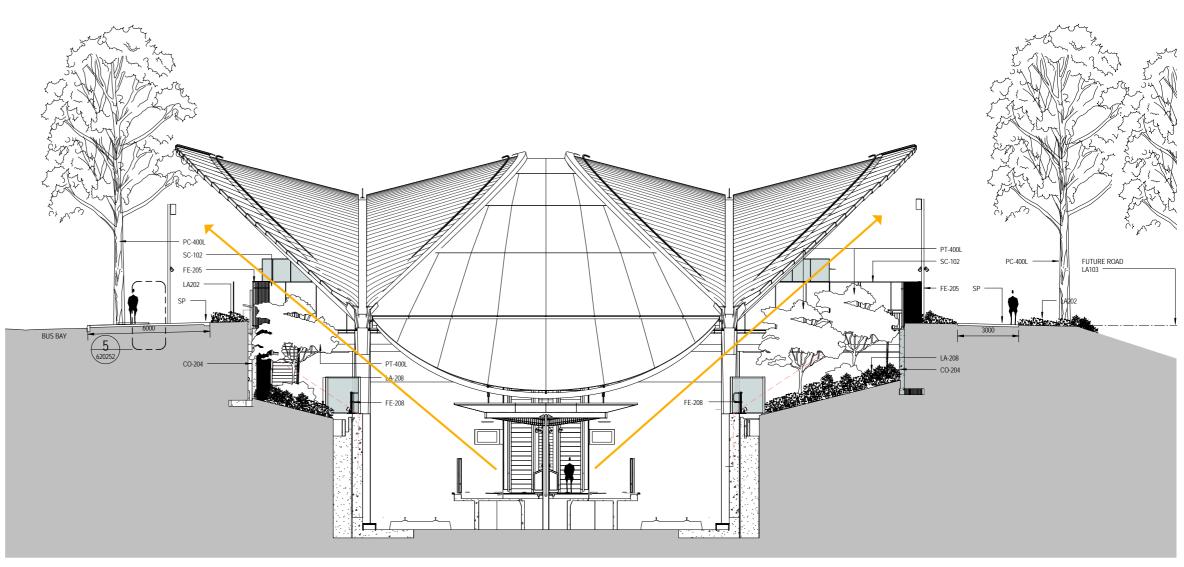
BLV\_Section showing terrace cutting and sight lines. Source: HASSELL.
